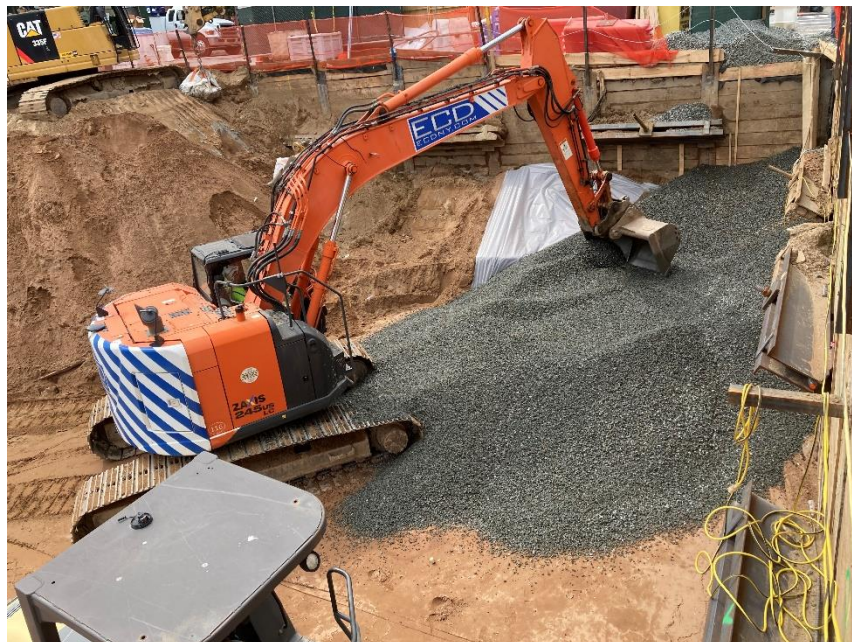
View of 3/4-inch stone placement as a subbase layer in the southwestern corner of the site, facing south.
